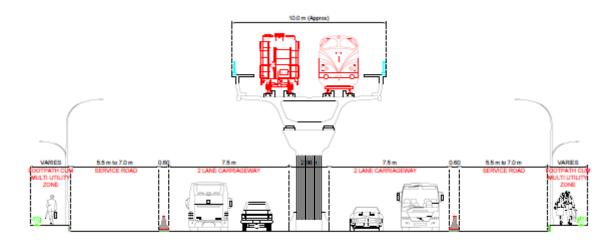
Typical Cross Sections - K R Puram to Hebbal Section
